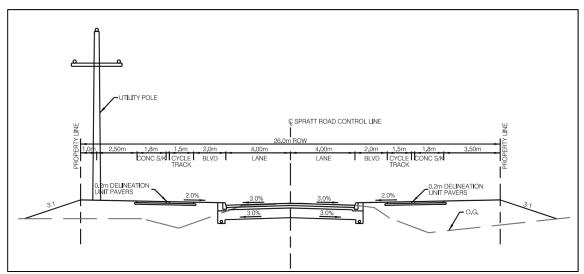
Typical Cross-section Plan - Spratt Road Urbanization RMA
